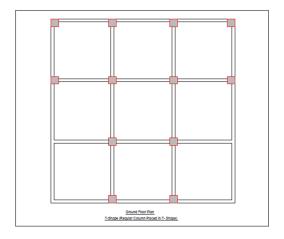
Ground floor plan of T-shape (With Regular Columns placed in Plus Shape)
